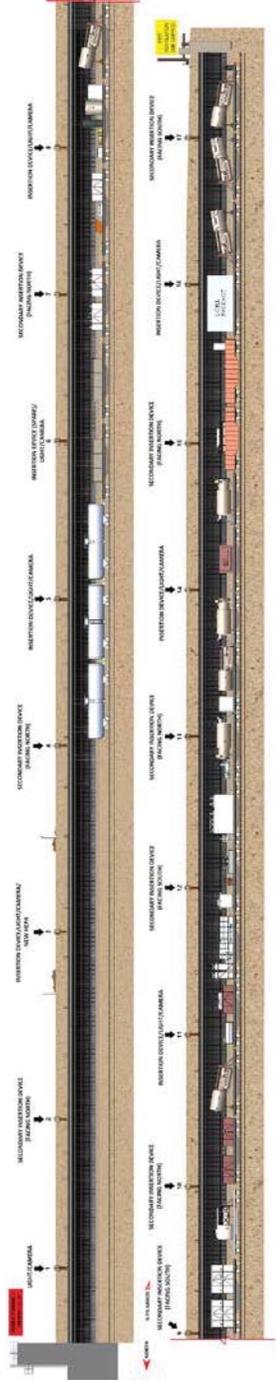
Location of Risers and Equipment for Grouting Tunnel Number 2
